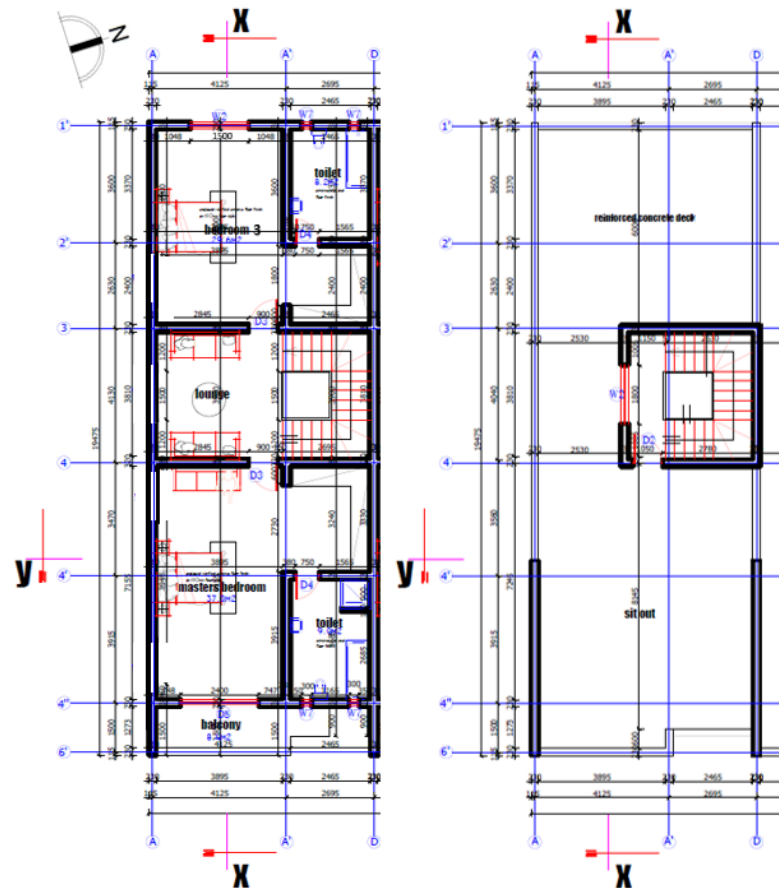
Second Floor Plan (to the left) and Pent Floor Plan (to the right) of a Terrace Unit in Case Study One
